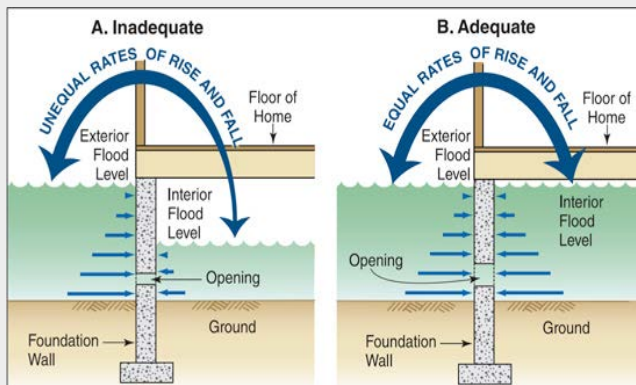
Foundation Hydrostatic Pressure*. Graphic demonstrates the importance of installing the proper amount of openings to allow water to equalize on both sides of the foundation (MBM 2016).
